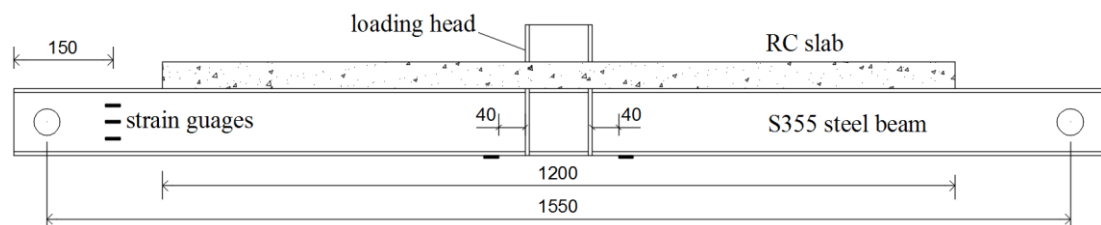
Elevation view of the beam-slab specimens B2 and B3
